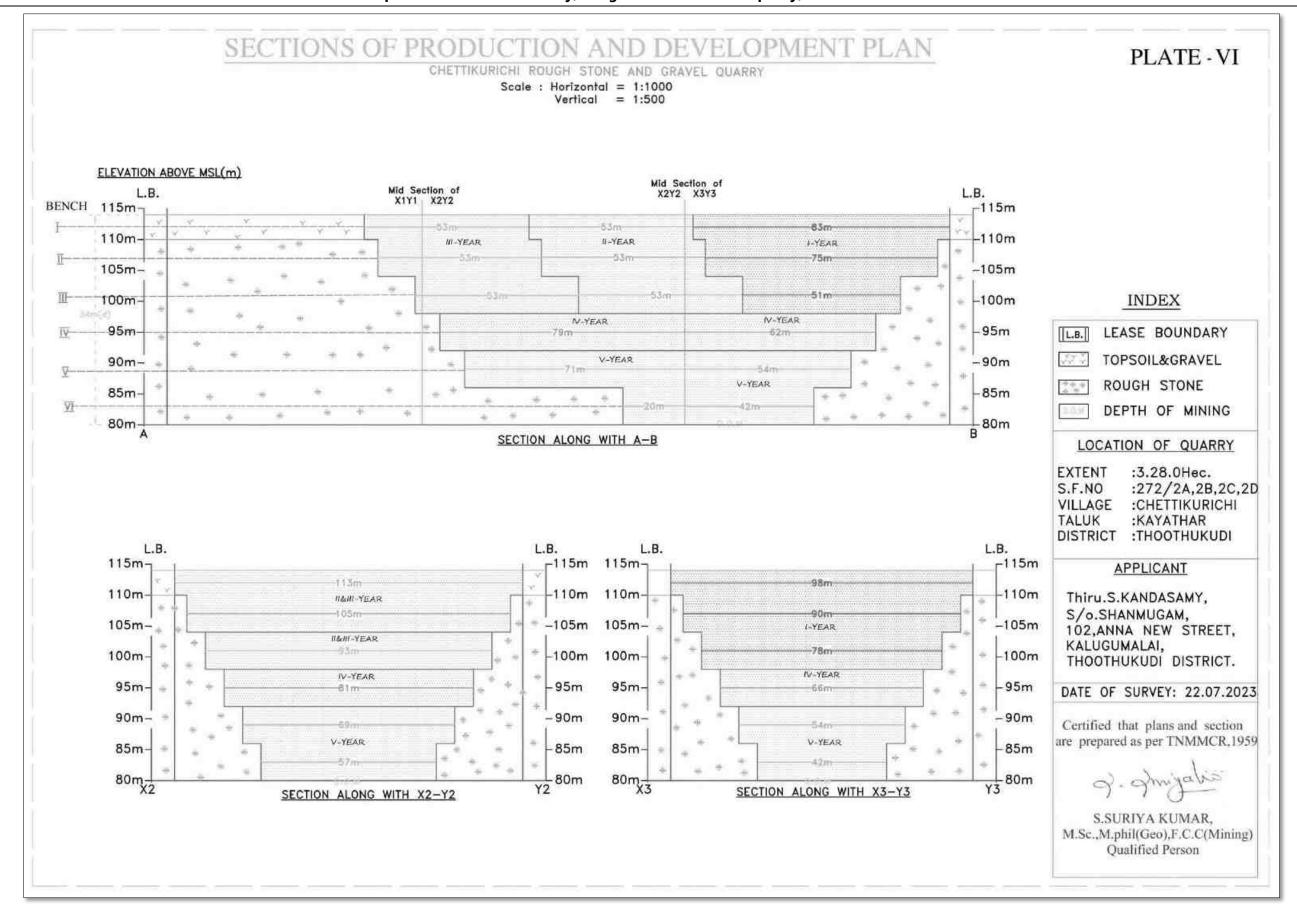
Section of Production and Development Plan (Plate – VI)
